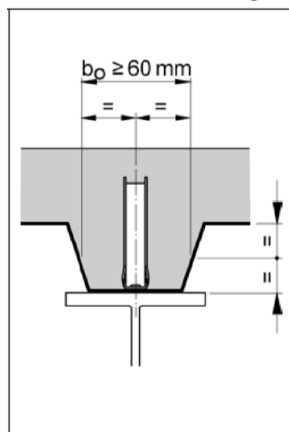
Spacing of connectors for slabs with transverse decking and connectors transverse to the beam (multiple rows).
